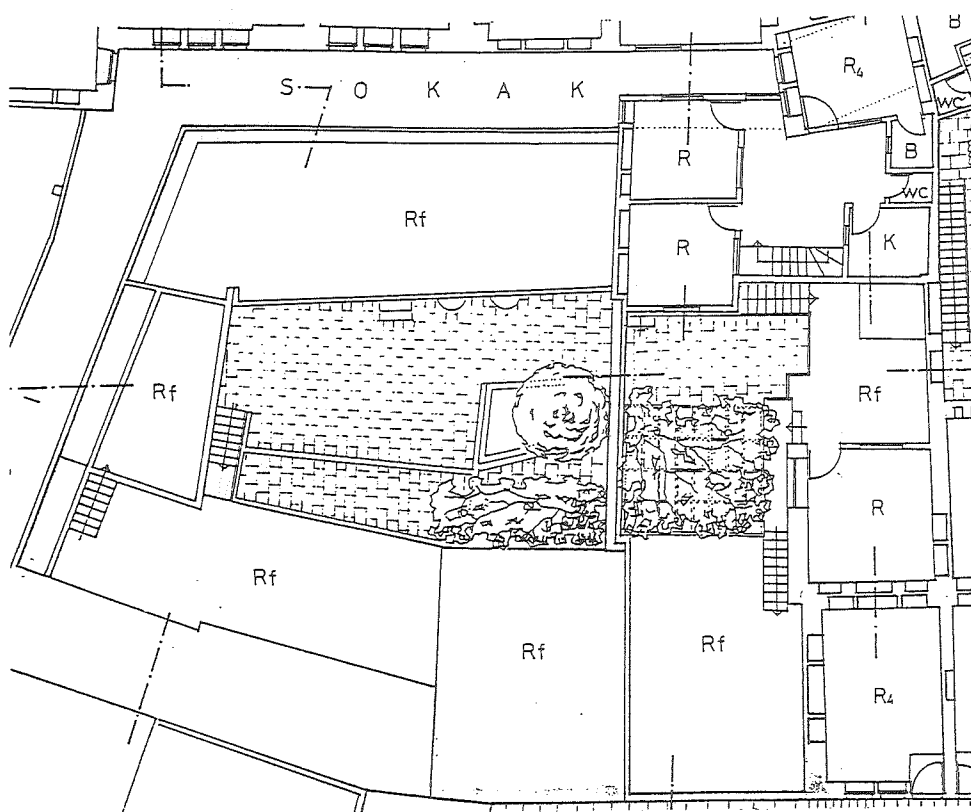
First floor plan of the "haremlik" part of Yorgancı House.
